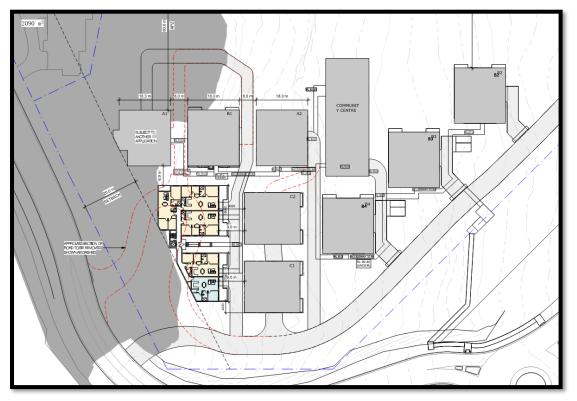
Ground floor Site Plan (Source: Vigor Master)
